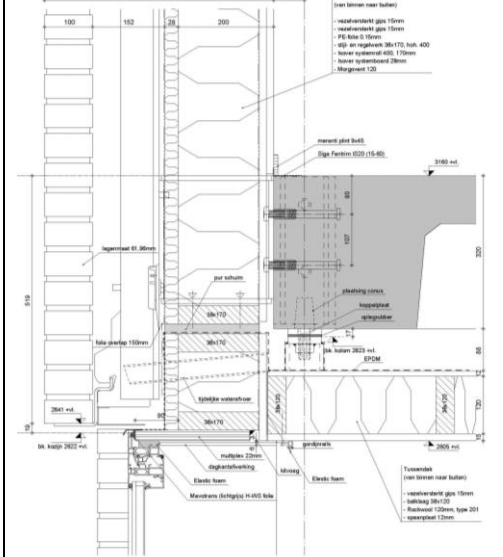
Details Uilenstede 500-502 building B (5 storeys)
